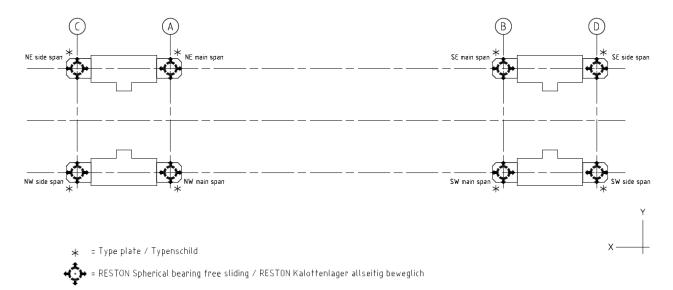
Schematic drawing showing locations of the eight required bearing solutions
